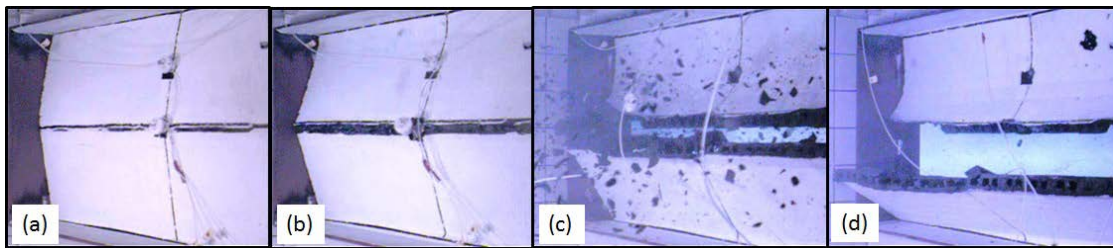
DW1: Frames from high-speed camera. (a) Wall cracks at midheight. (b) Wall hesitates slightly before complete failure. (c) CMU debris enters reaction structure. (d) Final wall position.
